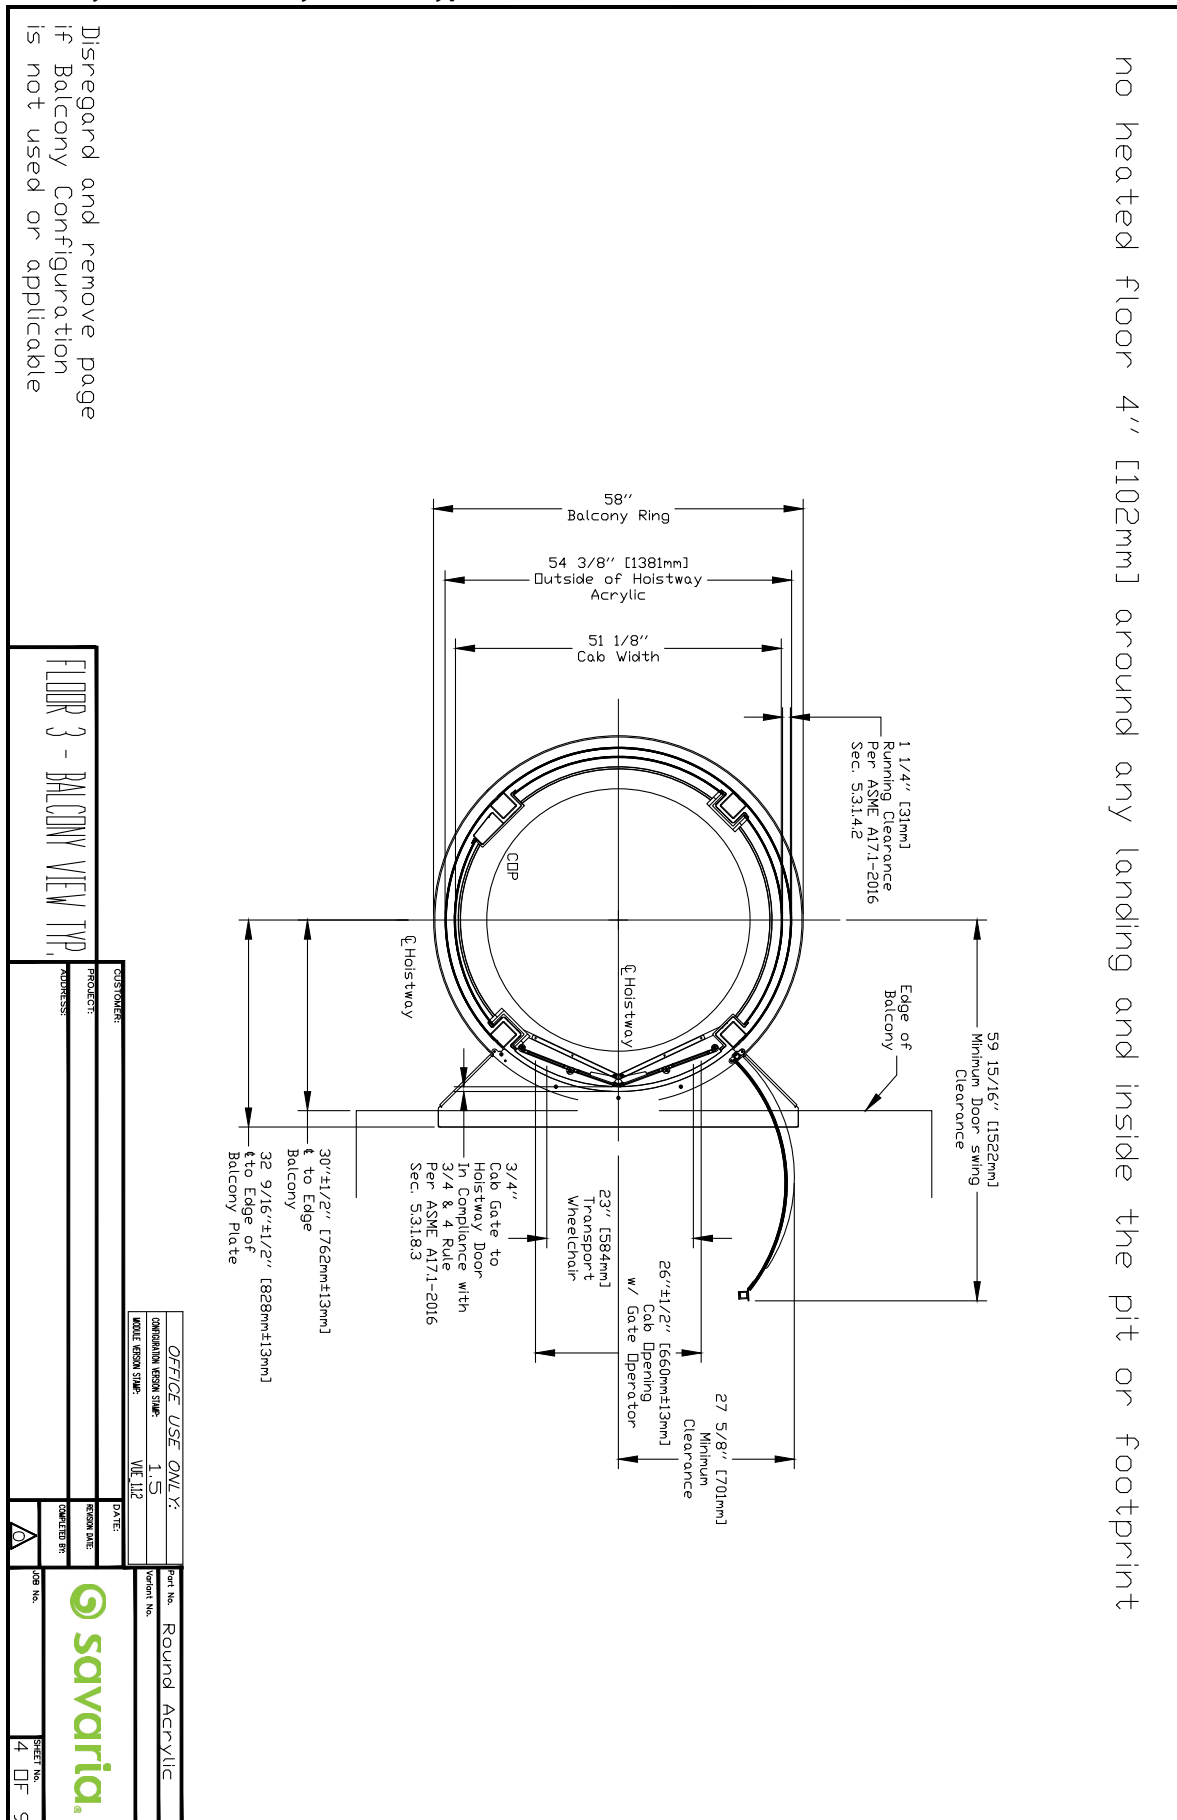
Balcony plate and handrail information - round acrylic (RAM) type 1 shown
